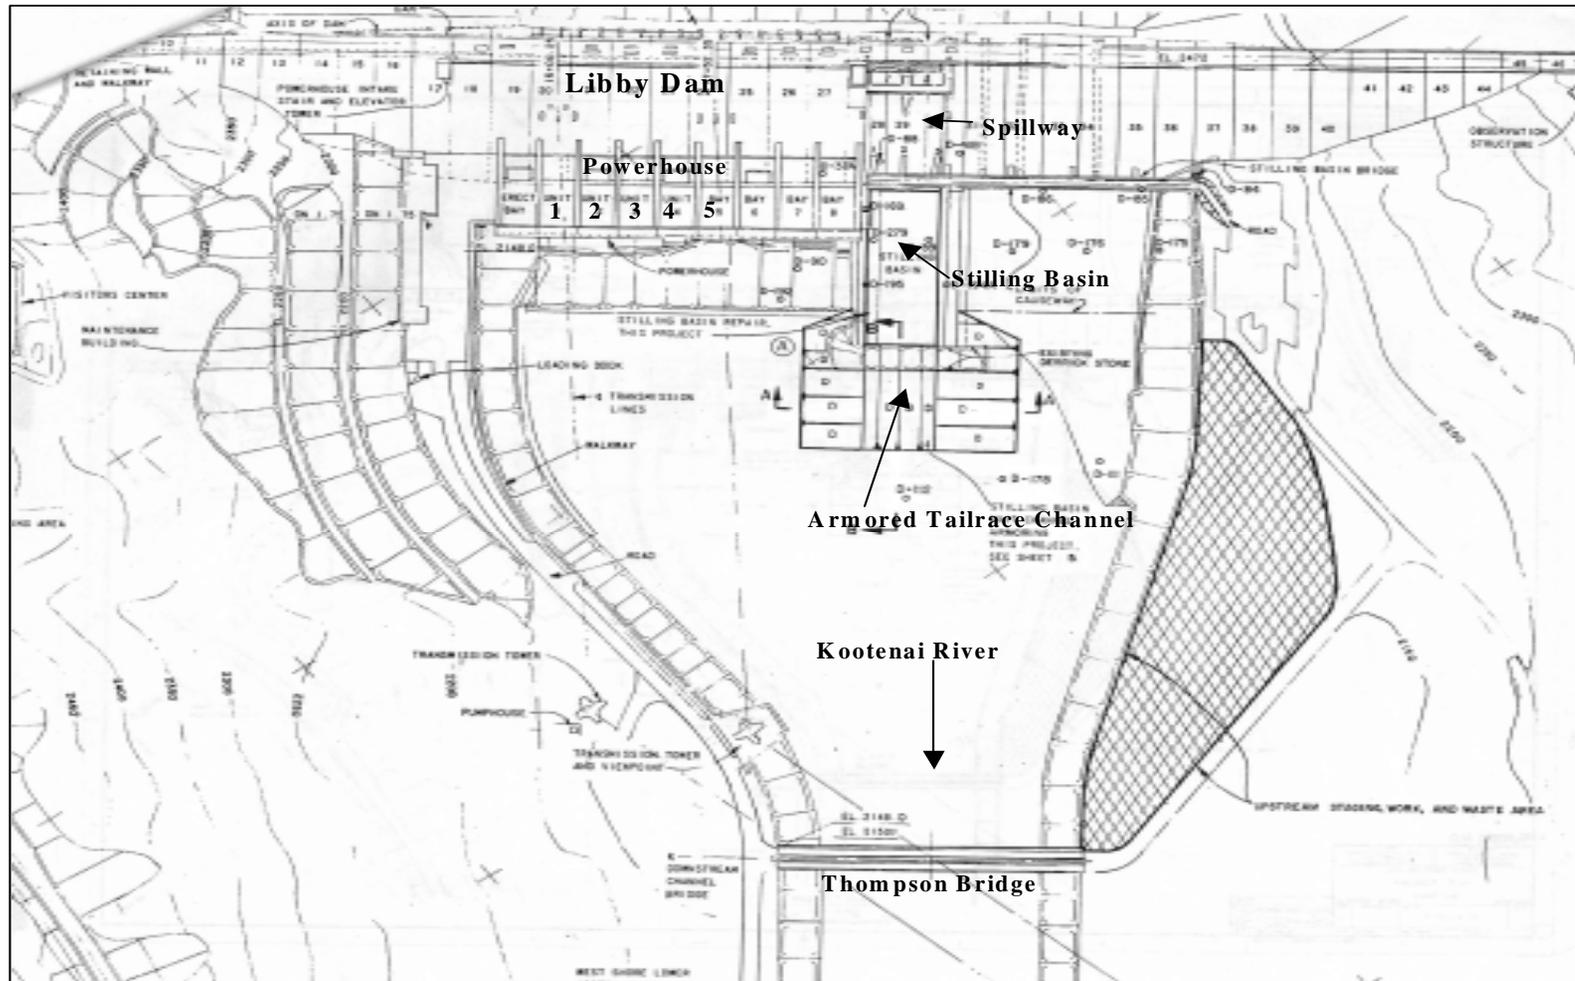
Libby Dam powerhouse, spillway, and stilling basin layout.
